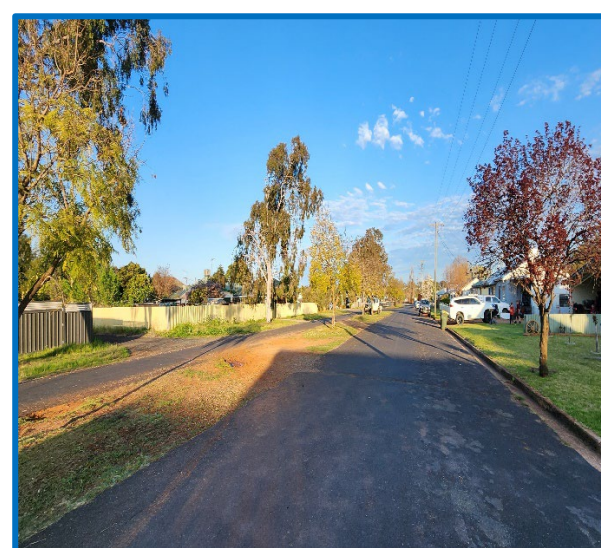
Macarthur Street: facing north-east after Intersection of Close Street & Macarthur and Laneway on Left
